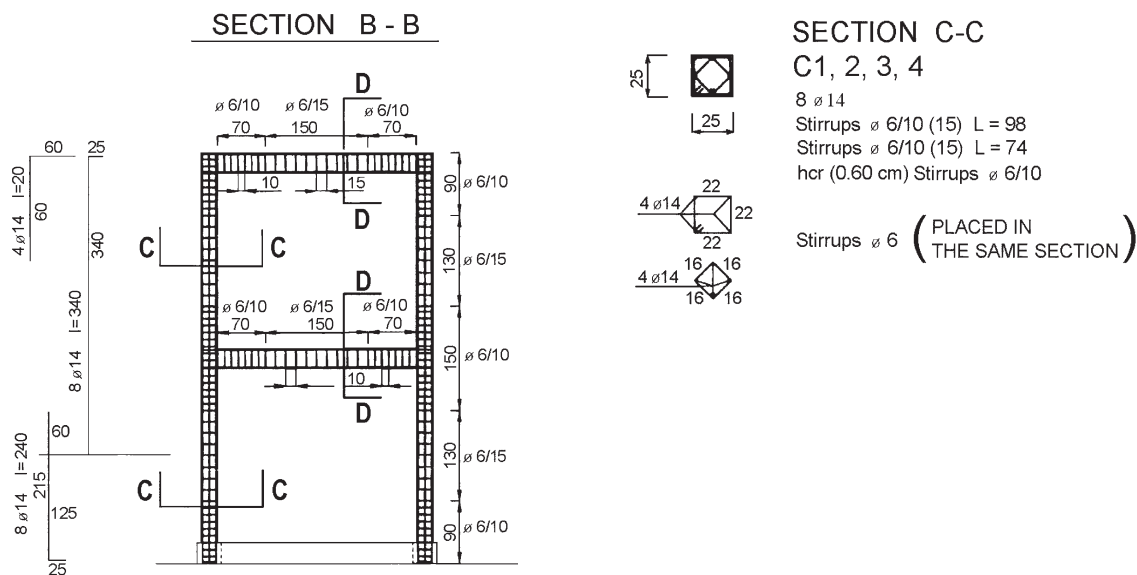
R/C frame model with masonry infills - steel reinforcement
